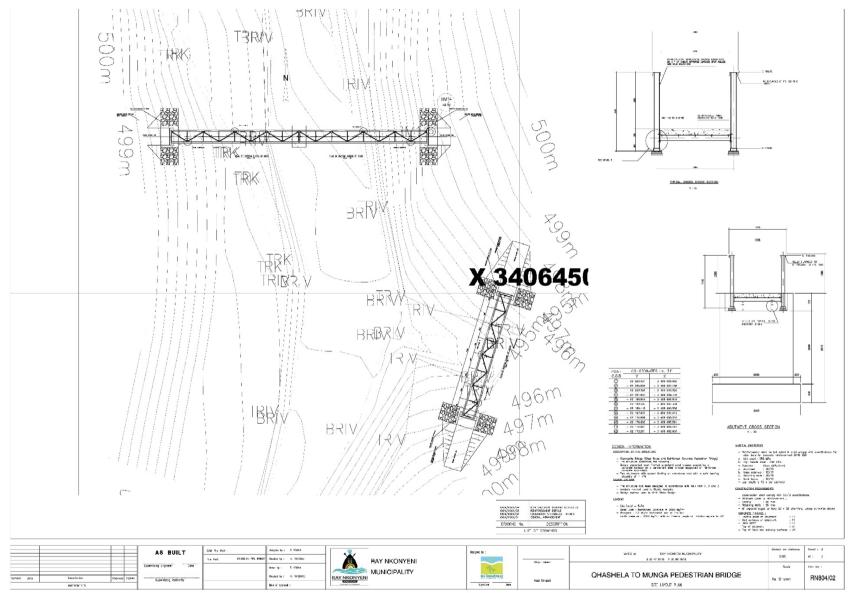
Mqhashela to Munga Pedestrian Bridges – Site Layout Plan – RN804/02
